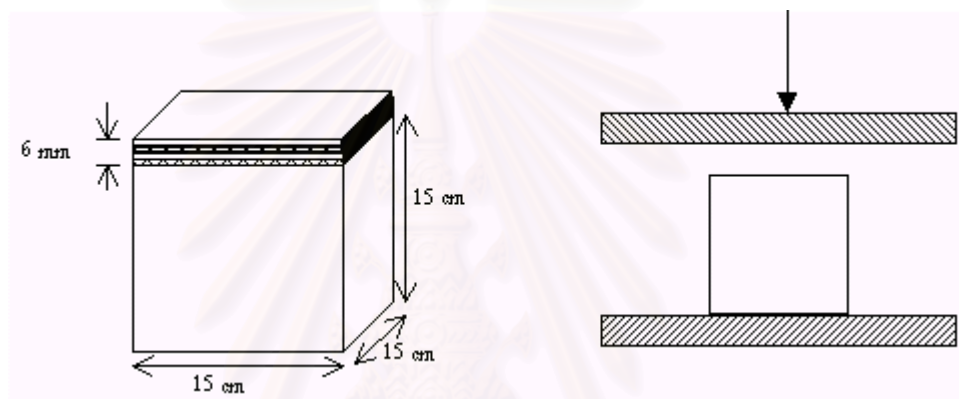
The arrangement and the dimensions of epoxy composite coated concrete specimen.
